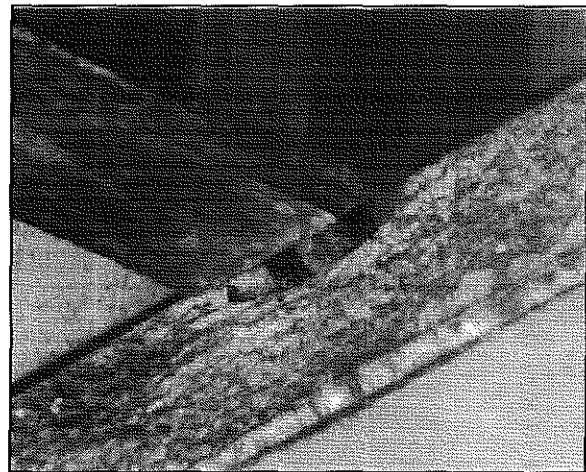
Concrete Spalling at Diaphragm-Girder Interface.
